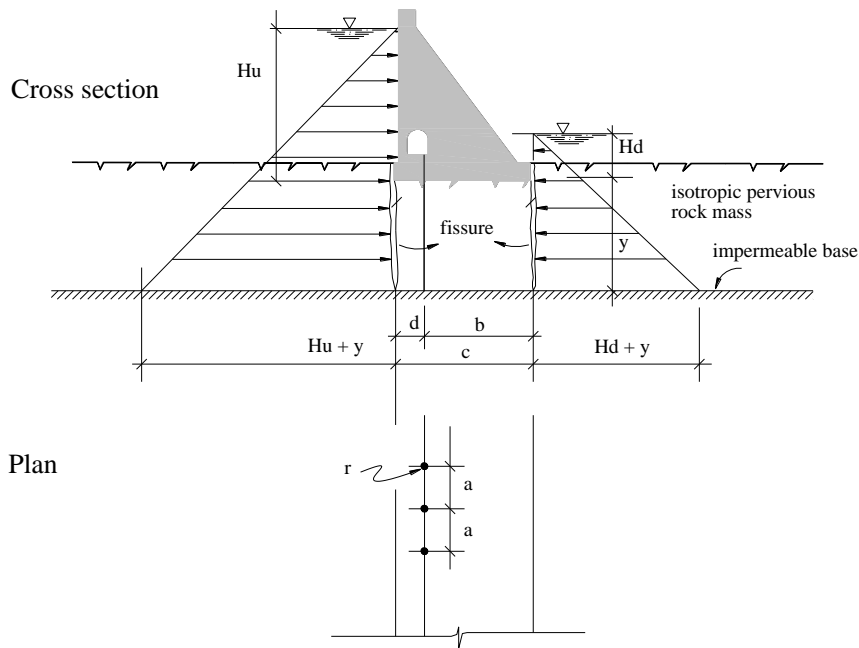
Seepage in a dam foundation: numerical model (after Andrade 1982).
